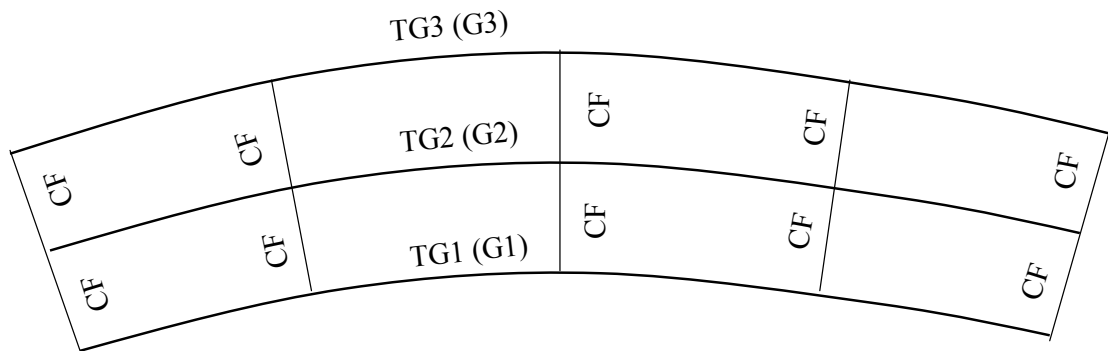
Schematic Framing Plan of Three-Girder Bridge
